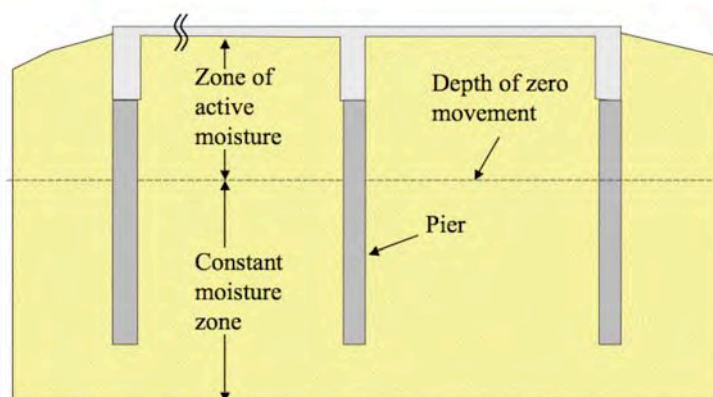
Drilled Straight-Shaft Concrete Piers
